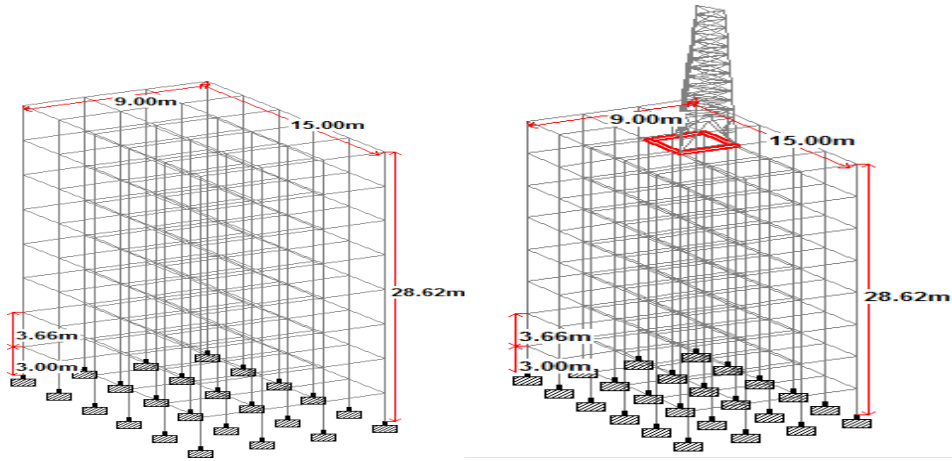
3D Elevation Model-1 Figure: 2 3D Elevation Model-2
